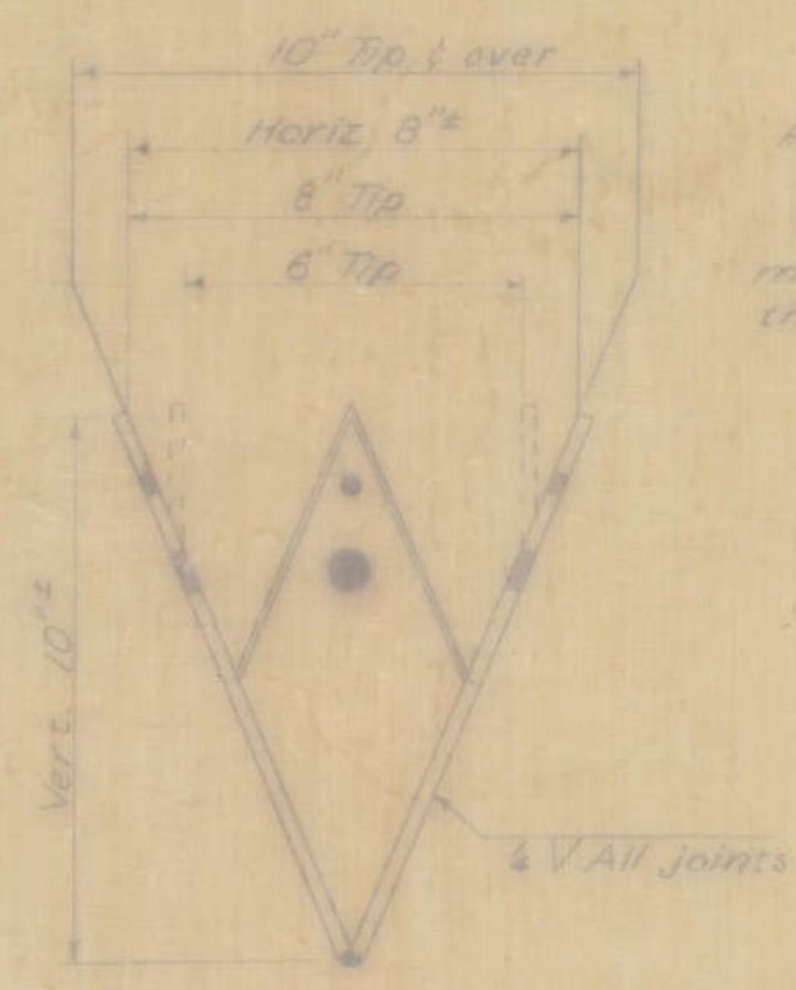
DETAILS OF VERTICAL EXPANSION JOINTS (C)
